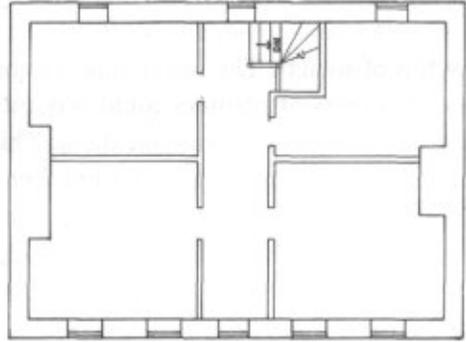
Mistake house, plan of first floor, c. 1725. (Long, "Historic Structure," 110.)
